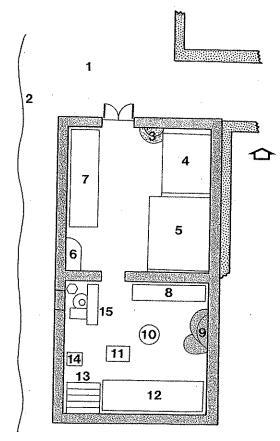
Schematic plan of Orlandi workshop, June 20, 1987 (not to scale): 1: yard; 2: scarp; 3: waster pile; 4: small kiln; 5: large kiln; 6: basin; 7: wood storage rack; 8: bench for working clay; 9: unprepared clay; 10: clay moistening basin; 11: hand-turned wringer; 12: drying shelves; 13: stairs to mezzanine; 14: wood stove; 15: kickwheel
